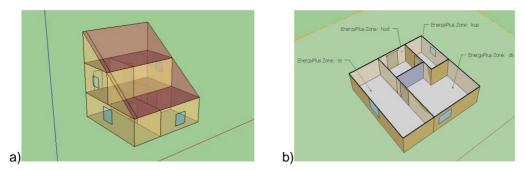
Modelled building: a) Schematics (X-ray); b) Cross-section of the first floor
